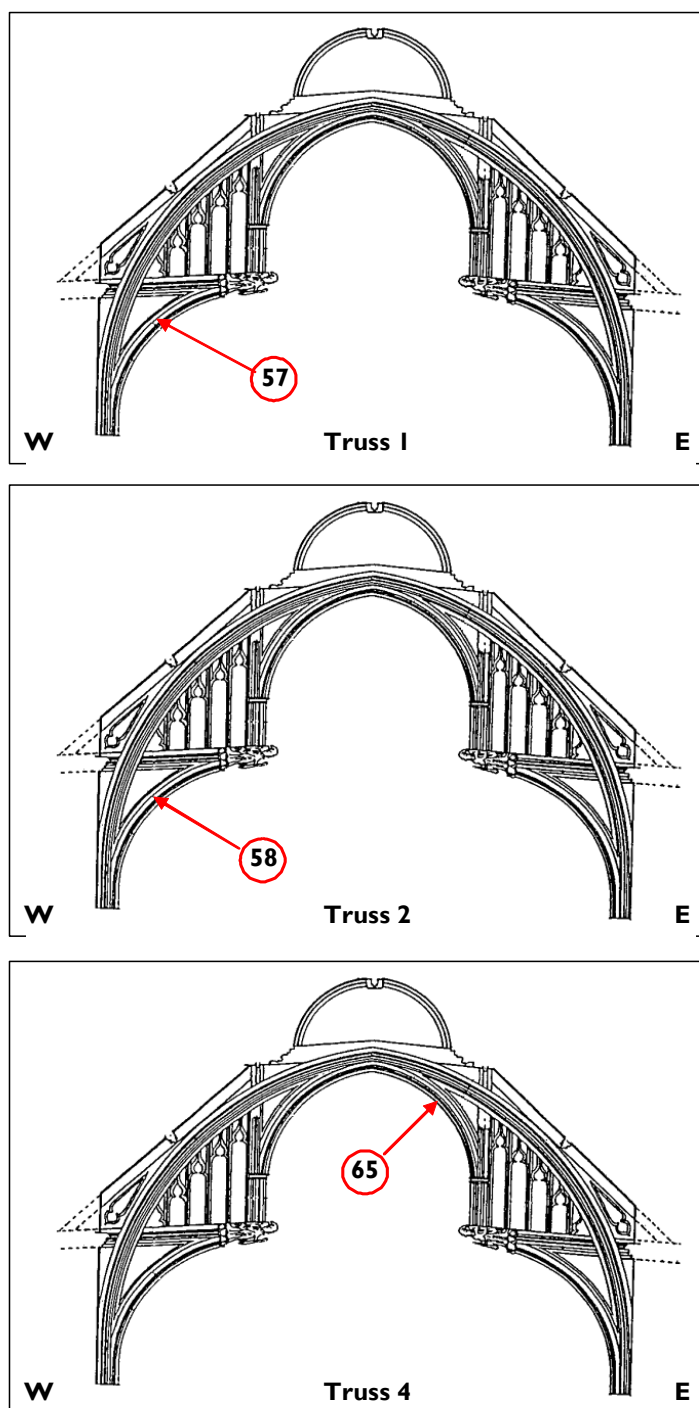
Law Library (rear west range); drawing of the trusses to show sample locations (viewed from the south looking north) (after Ministry of Works, Ancient Monument Branch)
